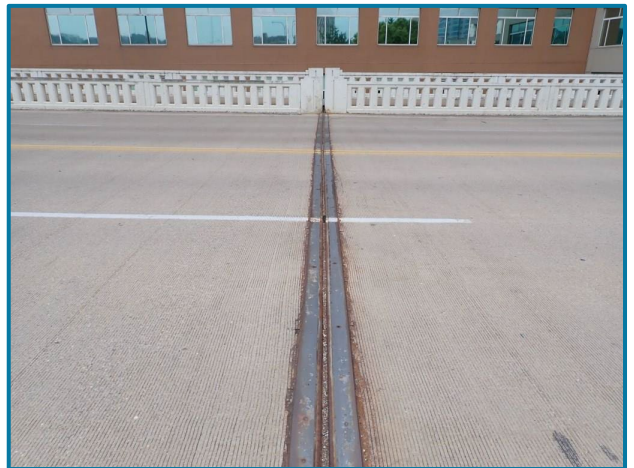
Surface corrosion to the full length of the deck joint armor (Pier 2 shown, looking south).
